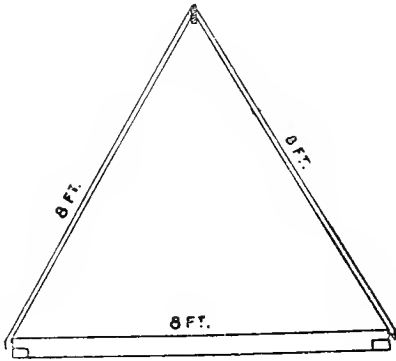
Fig. A.—Showing sills made of 4 by 4-inch scantlings, and slope of roof. Two 4 by 4-inch scantlings, 16 feet long, make the sills.
